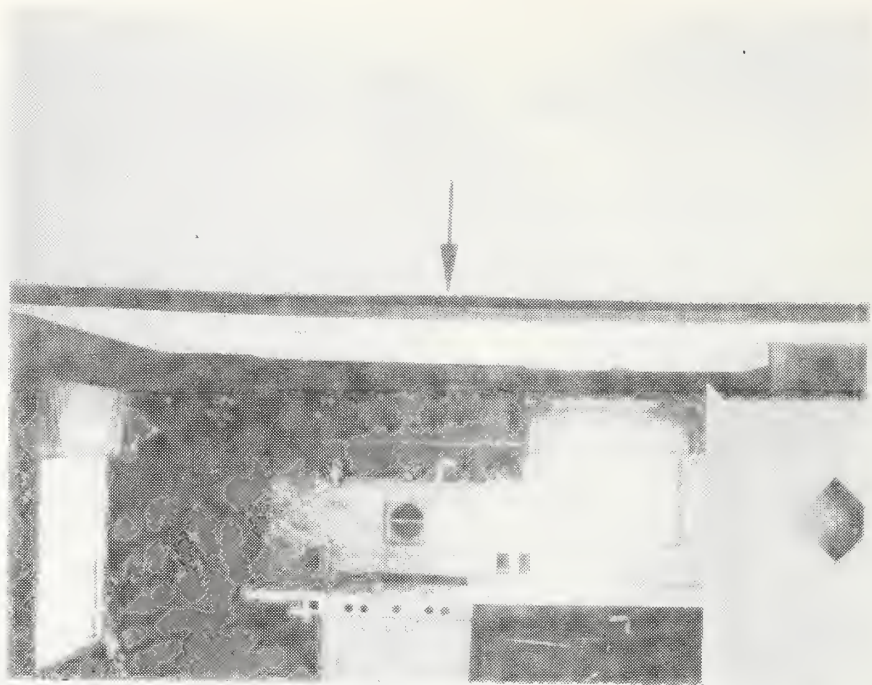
Failure of Ceiling/Roof Truss Attachment
